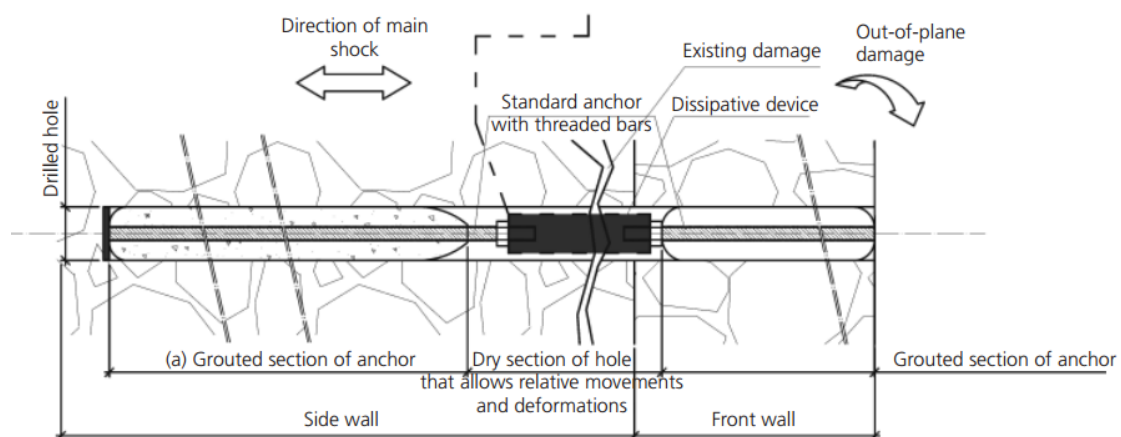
Set-up of dissipative anchor device coupled with standard grouted anchor and installed at damaged corner connection (D'Ayala and Paganoni 2015)
